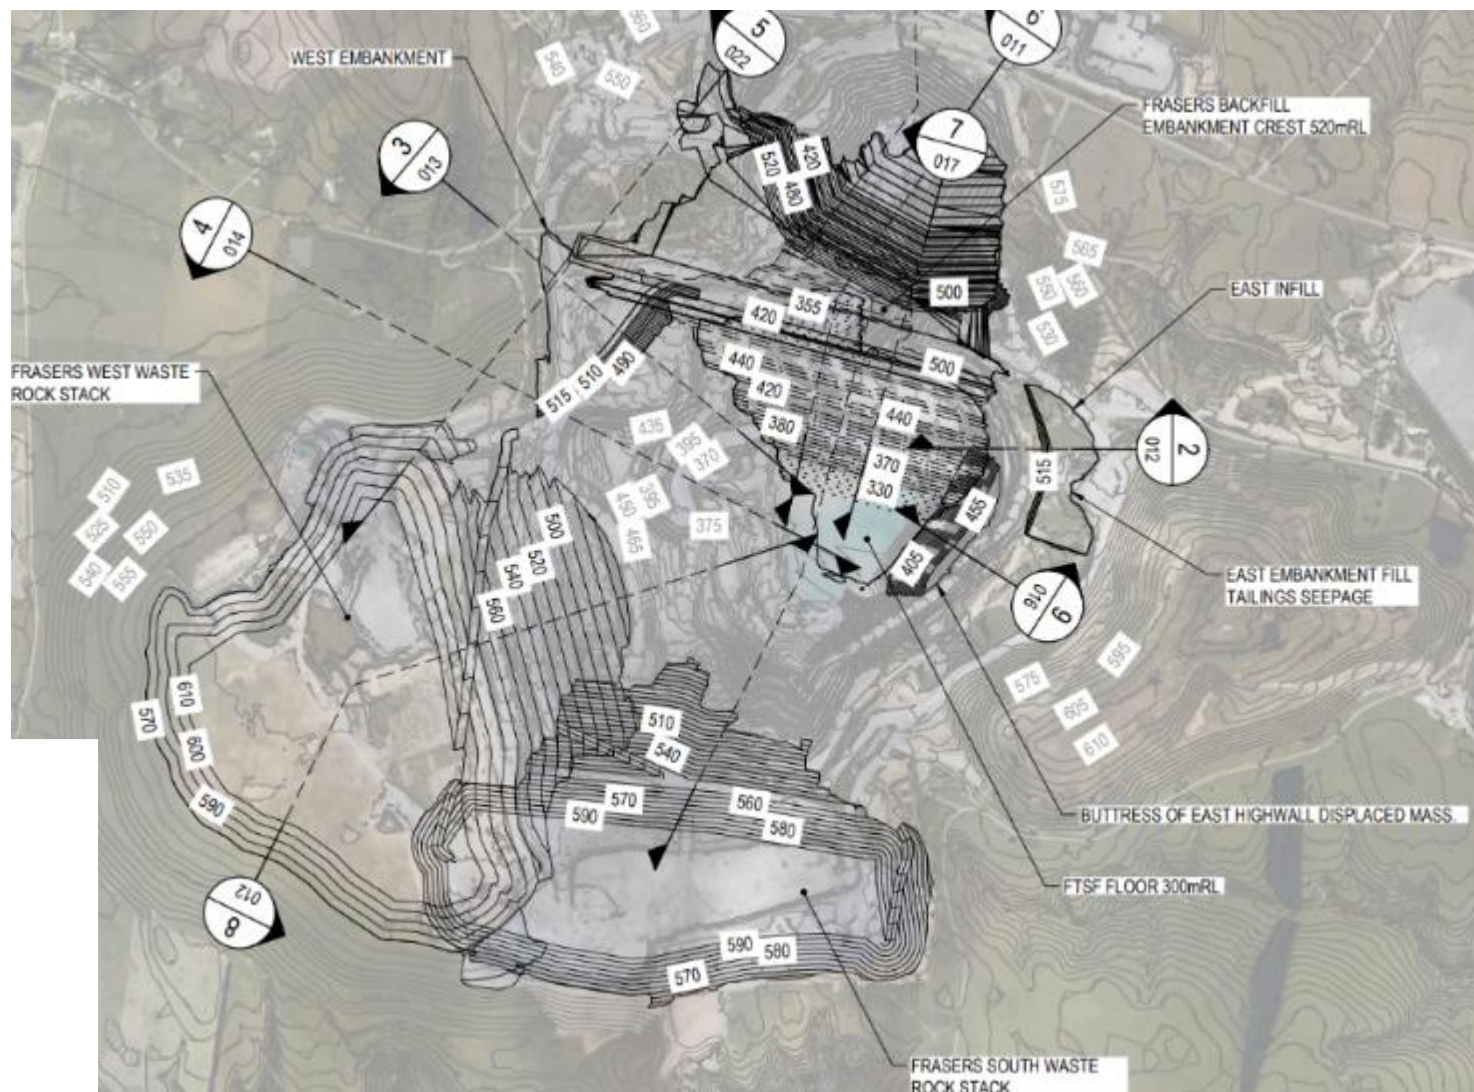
Frasers TSF Stage 3 Layout Plan
